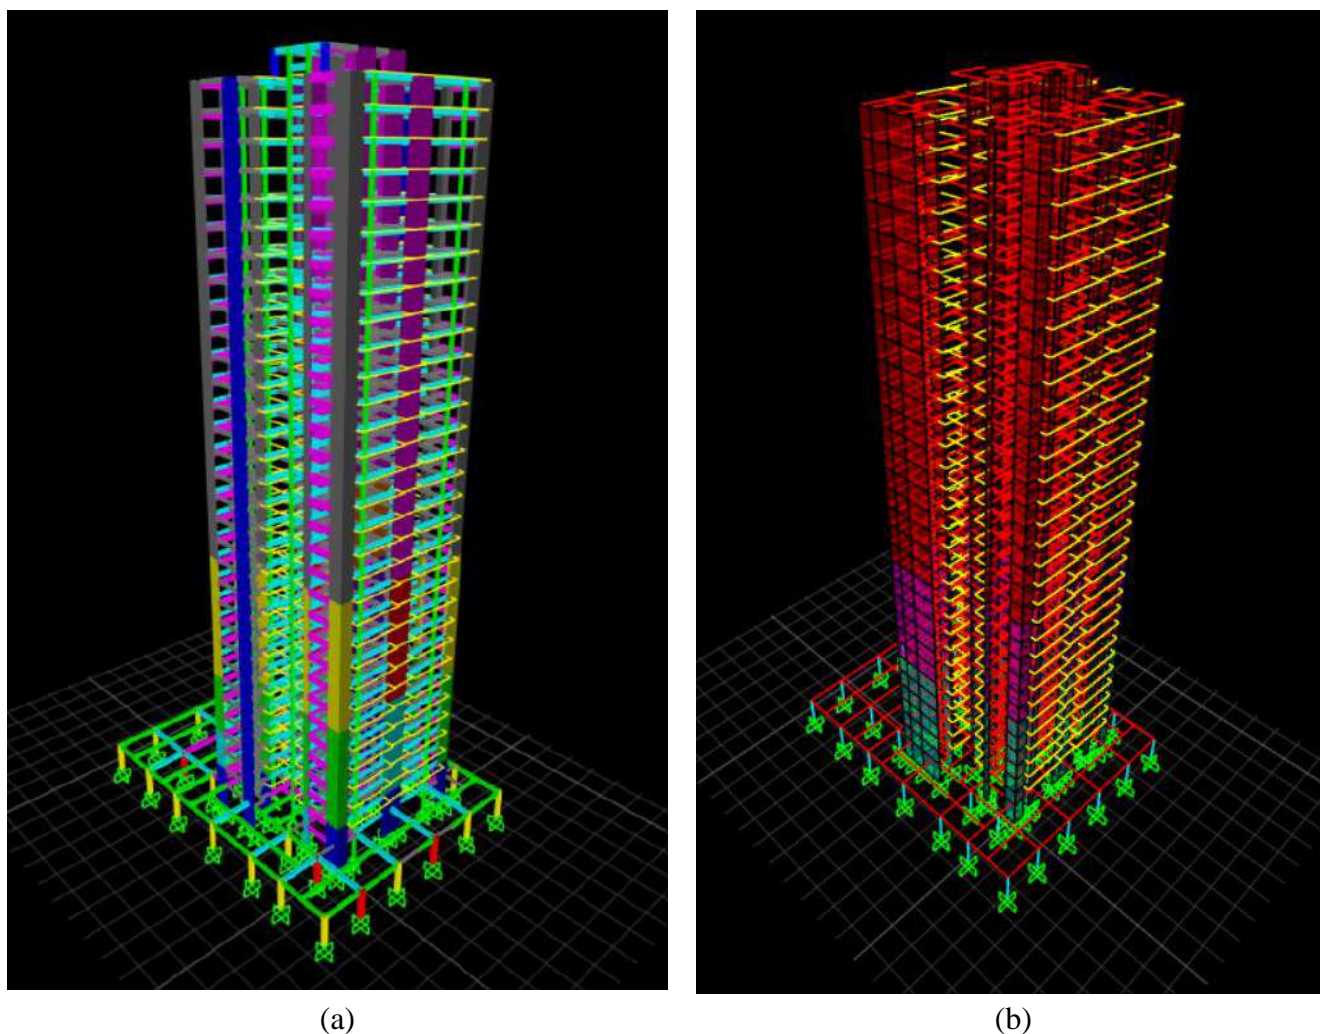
3D views (a) Dual System, (b) Shear Wall System
